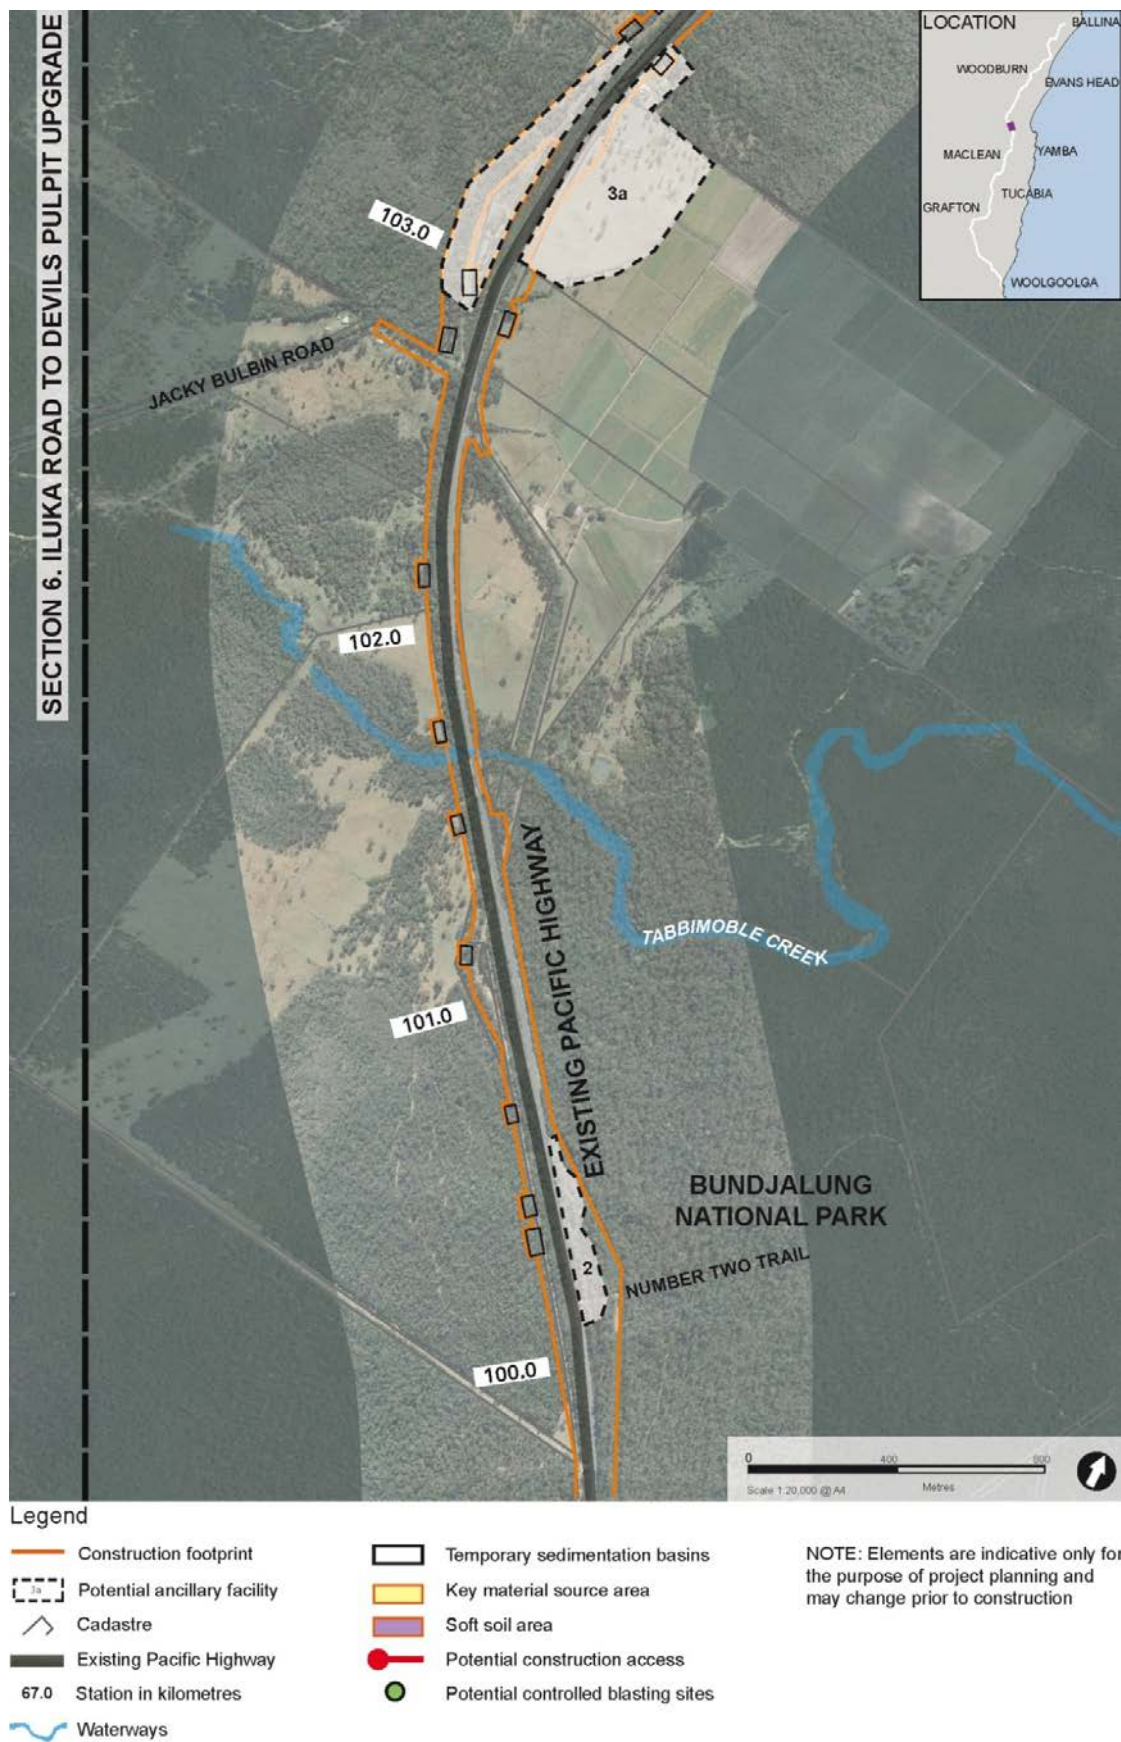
Extent of construction and construction features Section 6 (Station 99.8 to 103.7)
